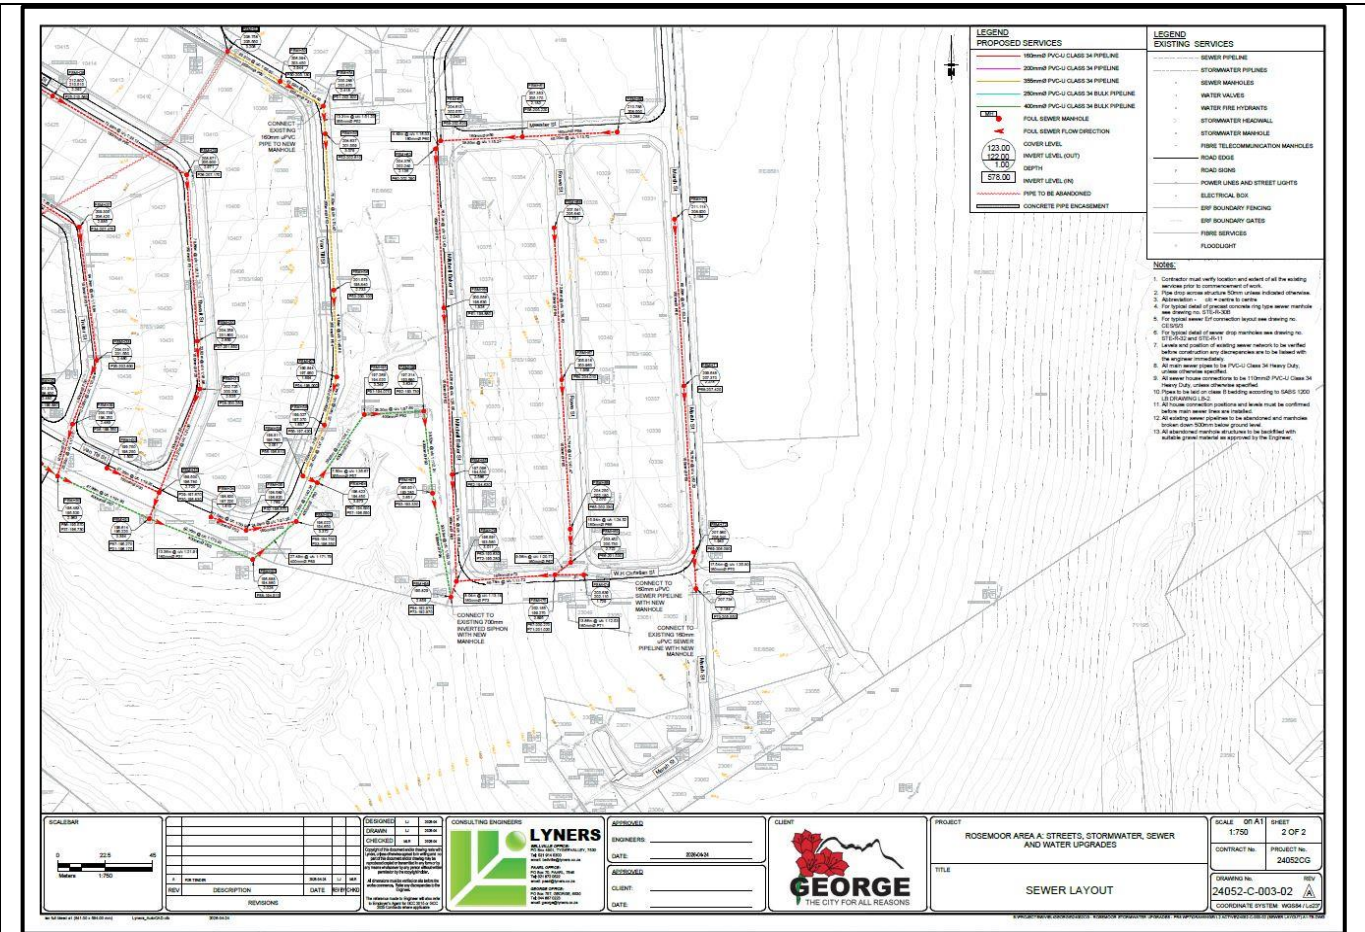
Proposed Sewerage Upgrades for Rosemoor.
